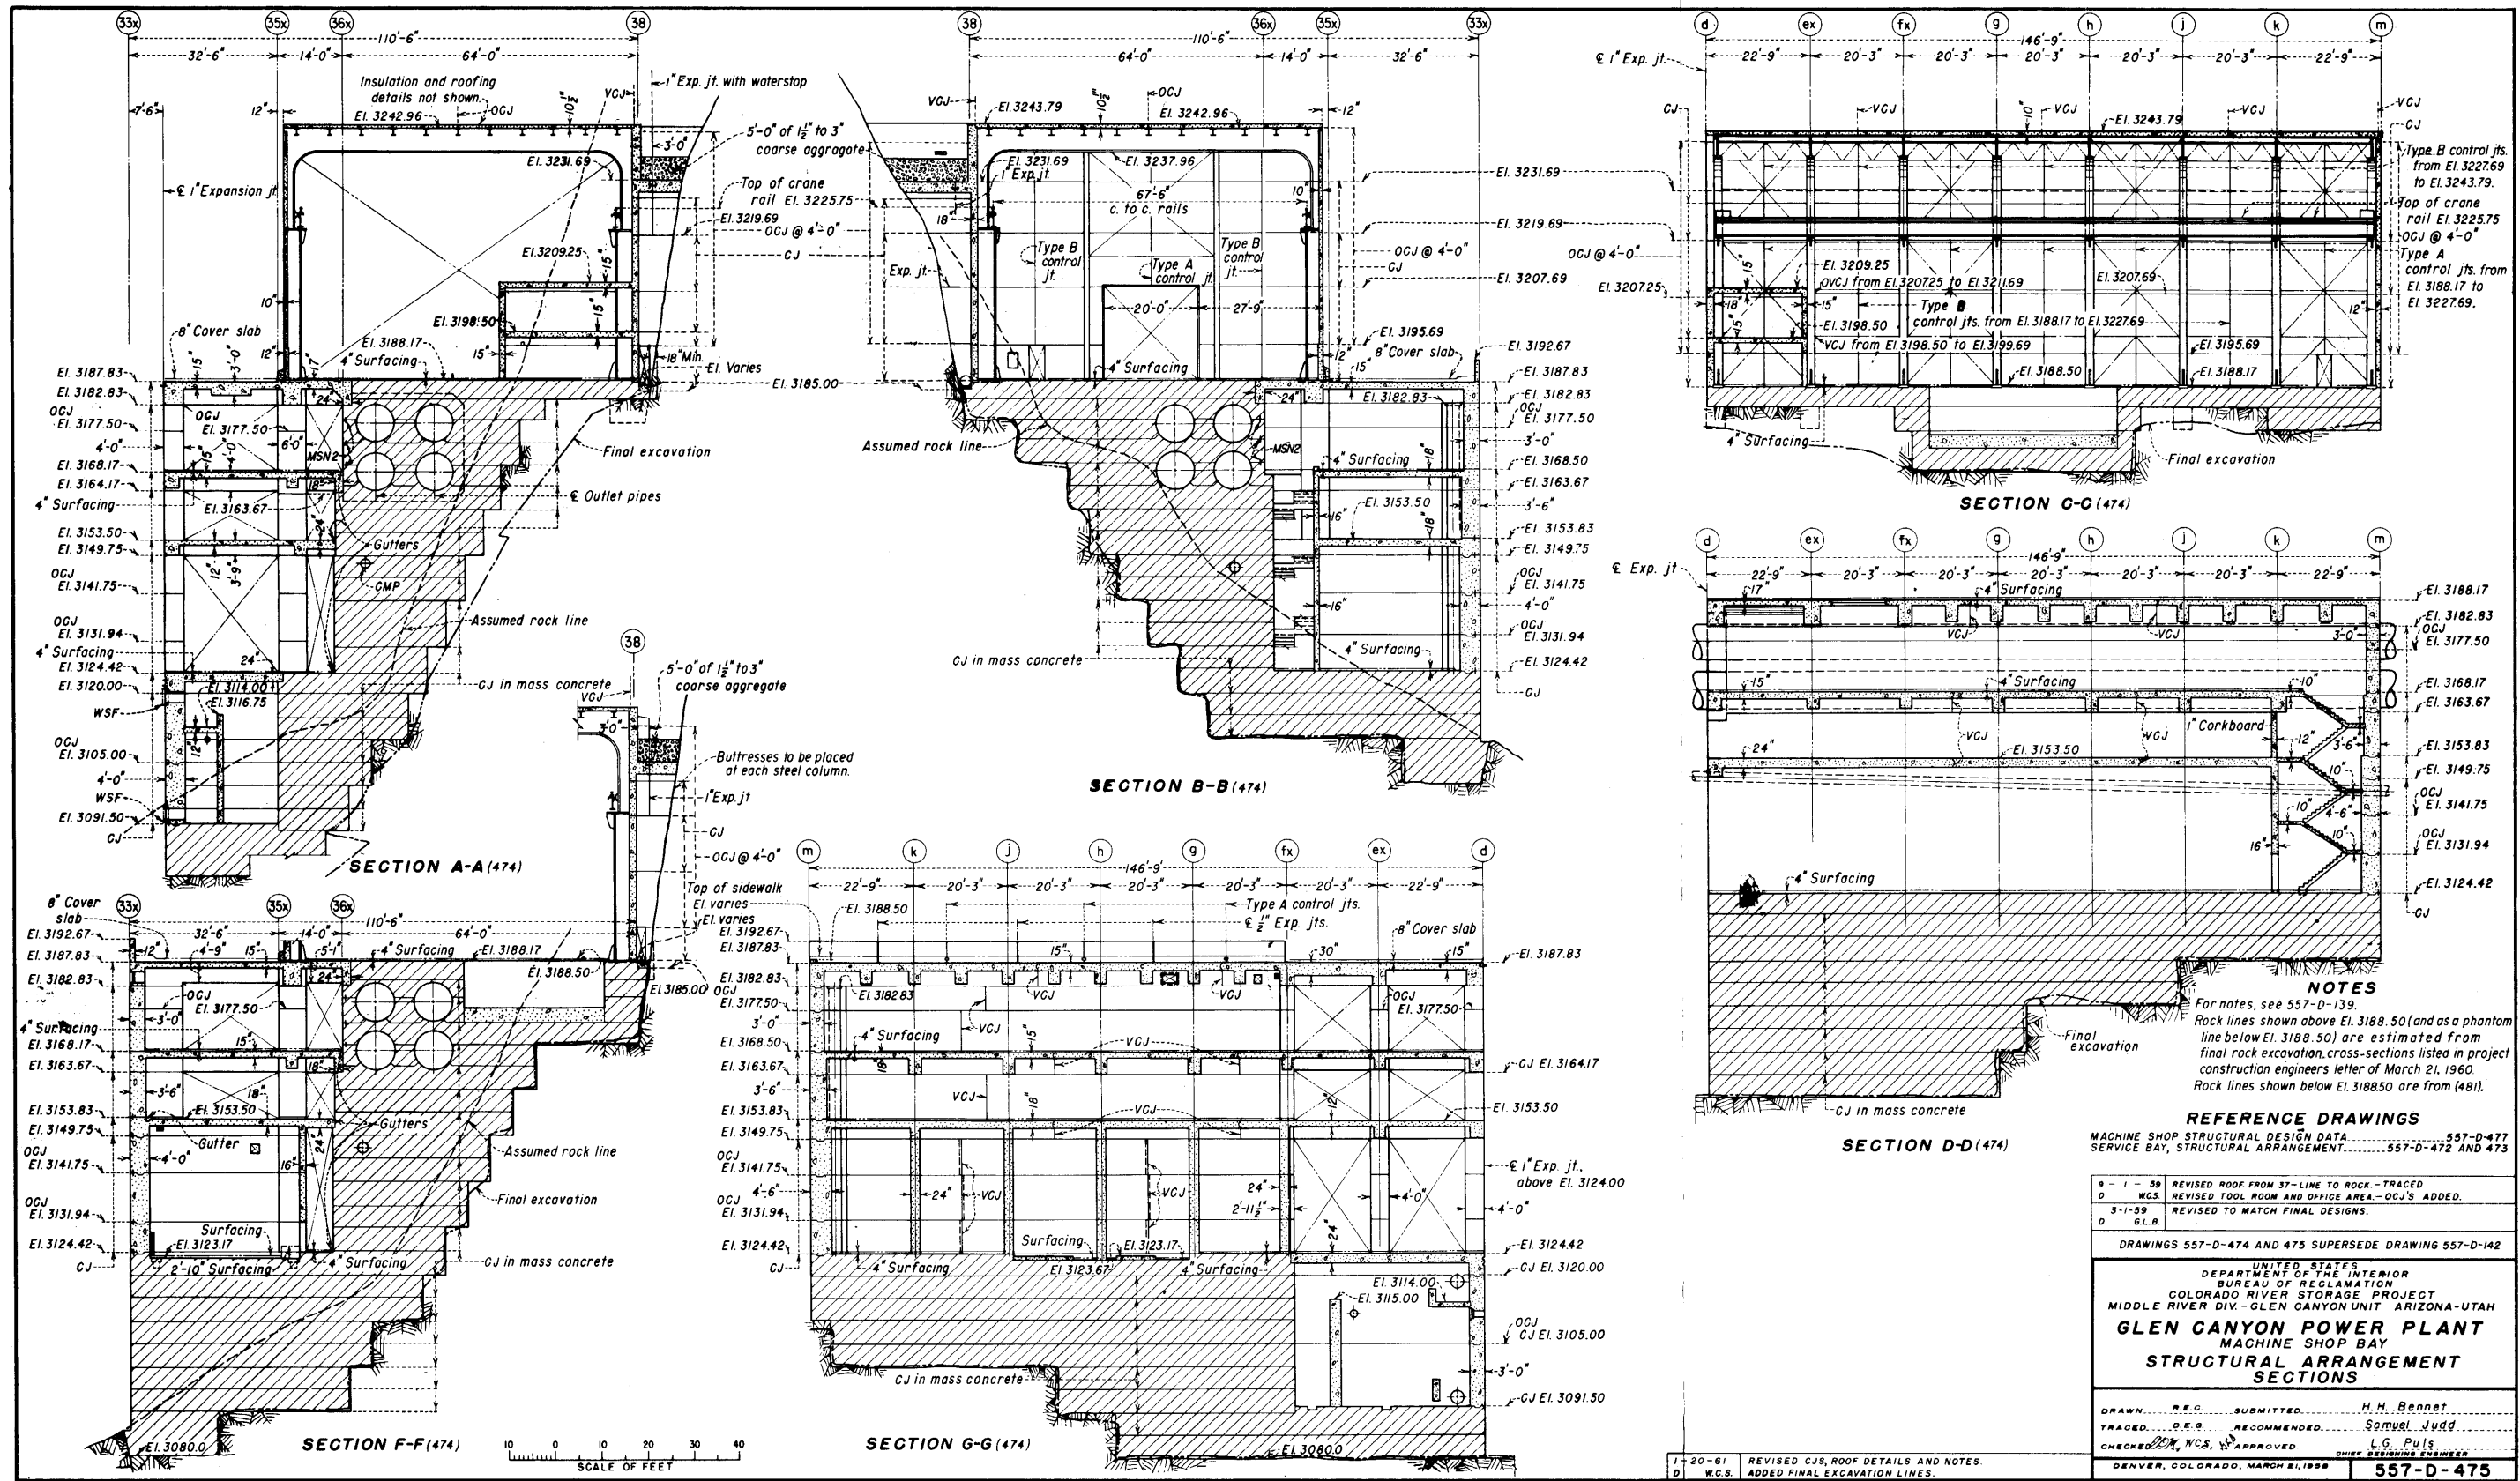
Powerplant structural arrangement sections—Machine shop bay.
